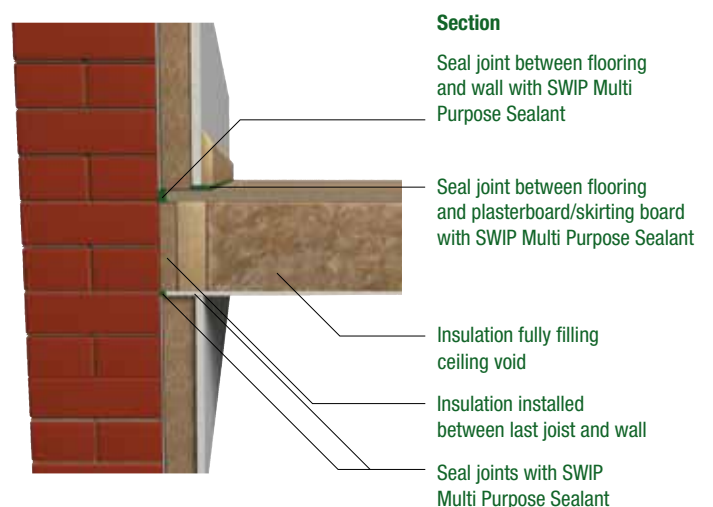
Floor zone insulation – joists parallel with separating wall
